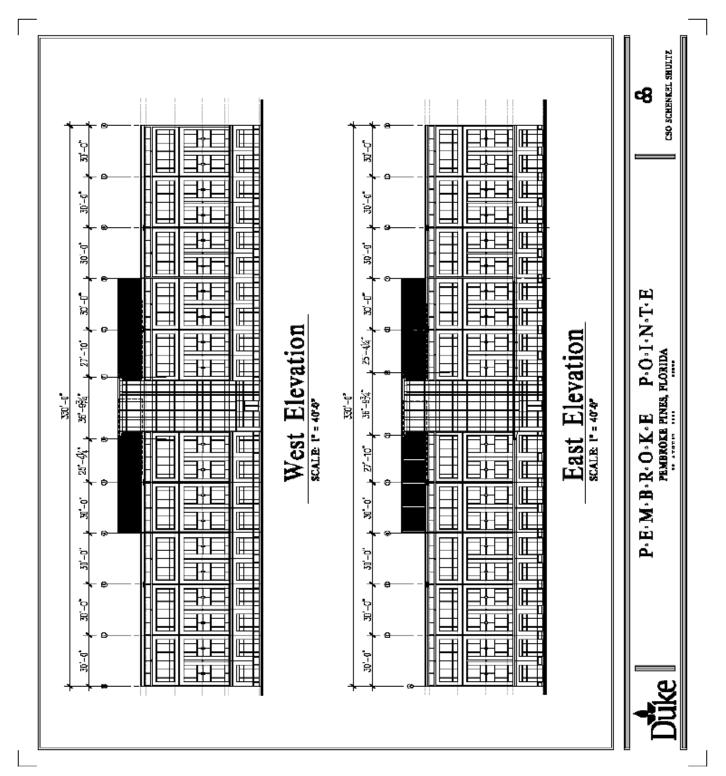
TENANT SIGNAGE PLAN AND ELEVATION PLAT A
